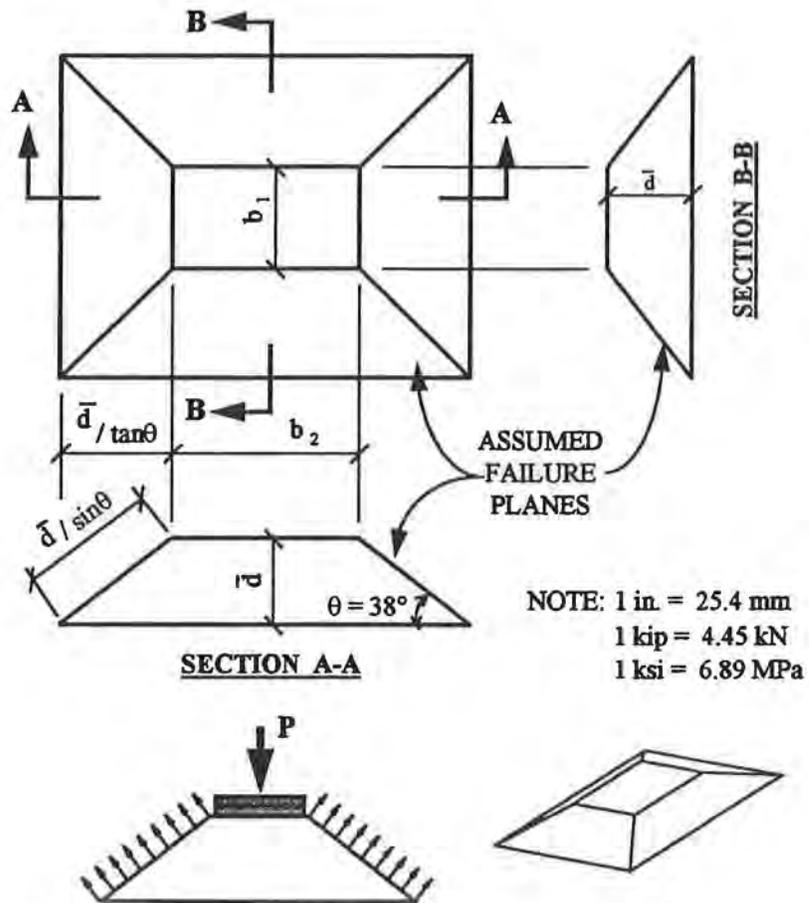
General Punching Shear Model Showing Assumed Failure Planes and Forces Acting in Equilibrium (15).
